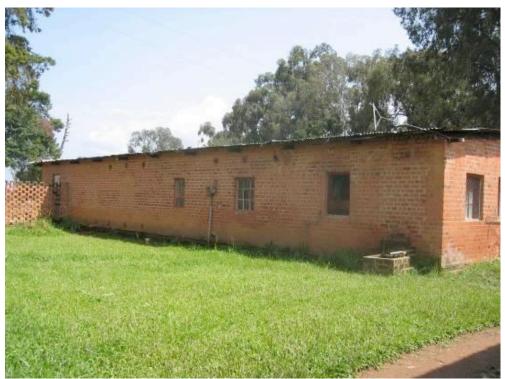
(Image 3) – The Washroom (Picture taken facing the Northeast)
